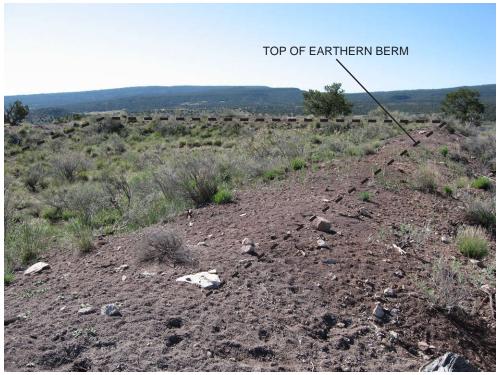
AOC 30, Igloo Block D, looking south at typical open storage area (Y-site).
